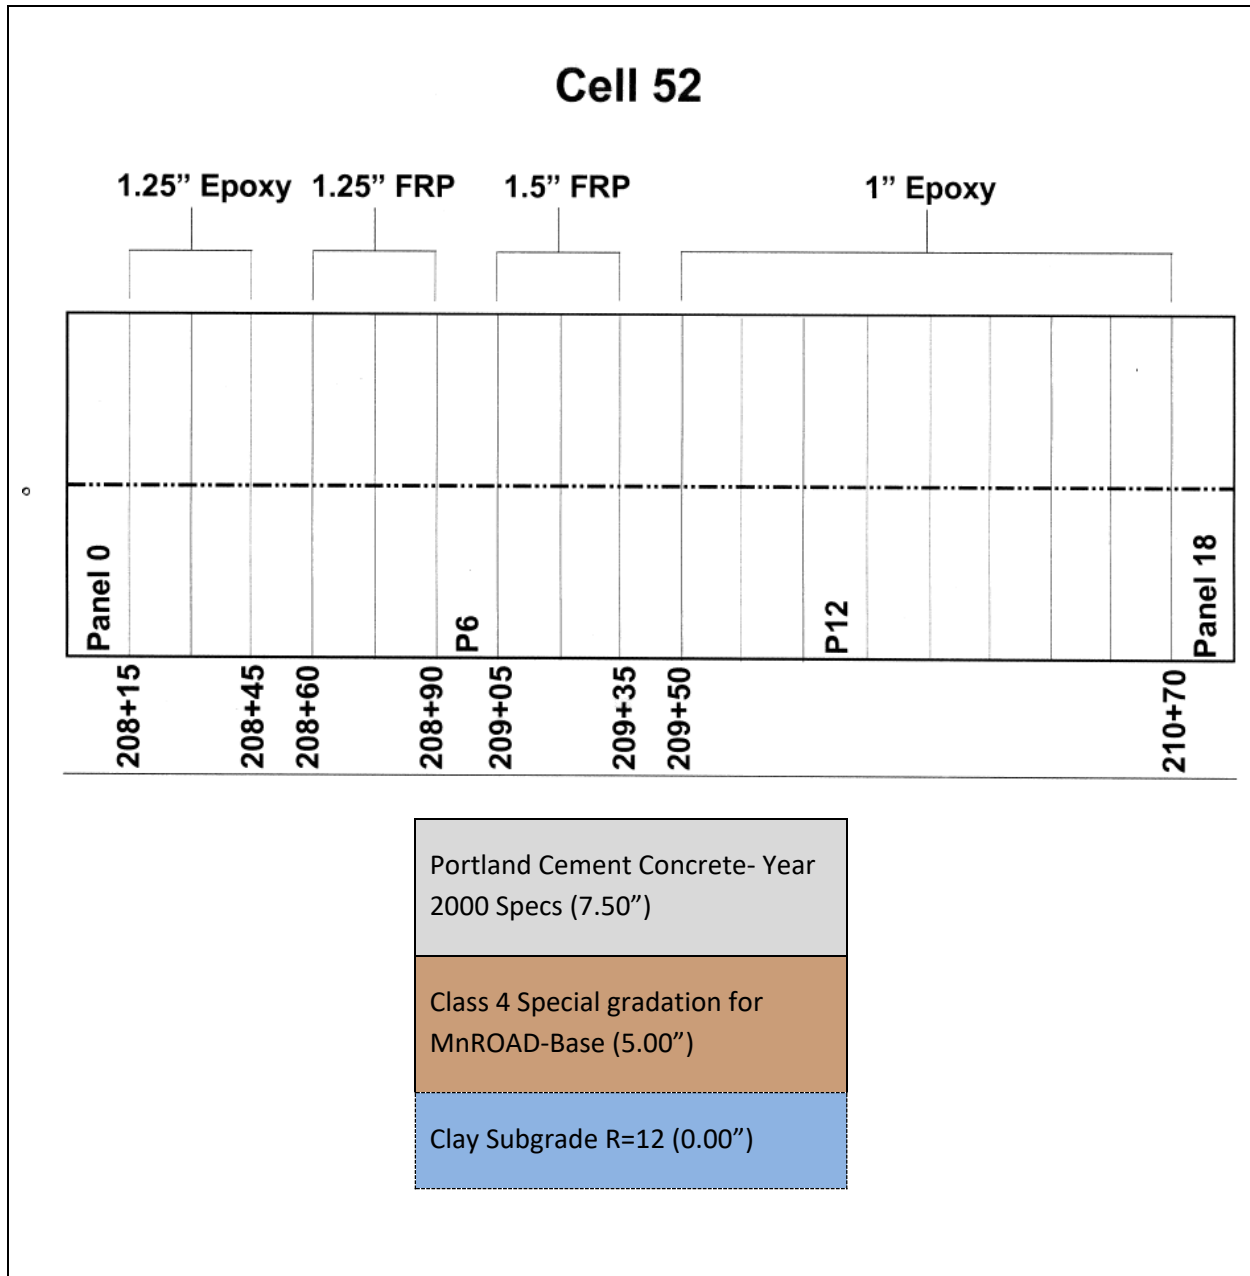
Layer Structure Design and Dowel Layout for Cell 52 at MnROAD from Construction Plans (2).
